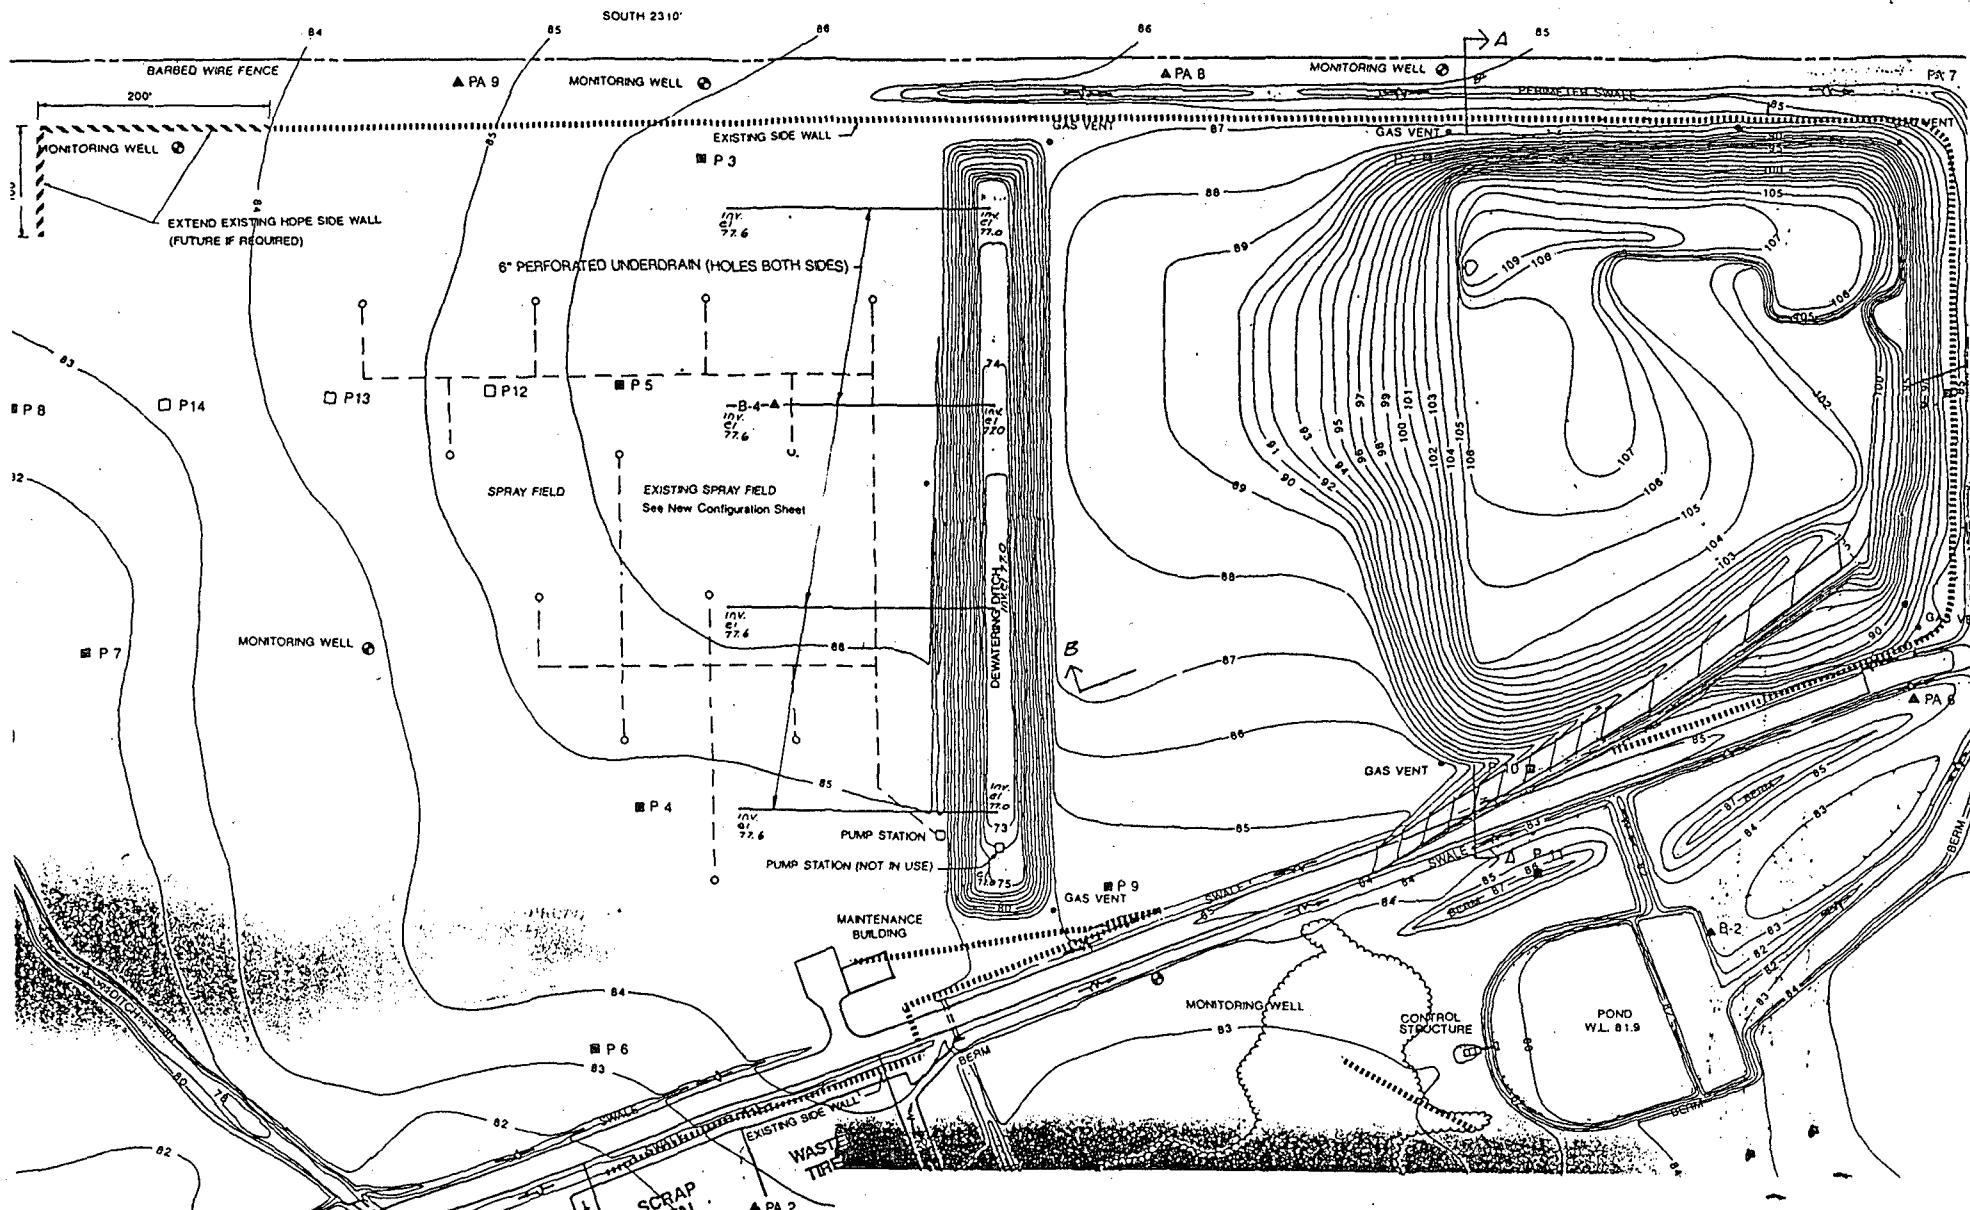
Improvement Site Plan (per 8/2/93 Wade-Trim Sheet 4/6)
